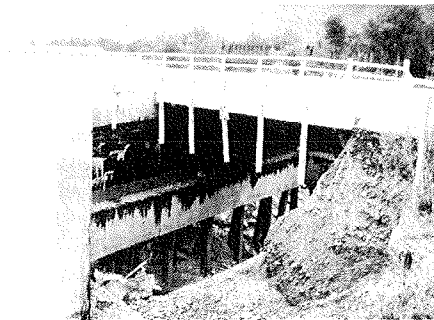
Exposed piling and undermined abutment of Chemung River bridge.
